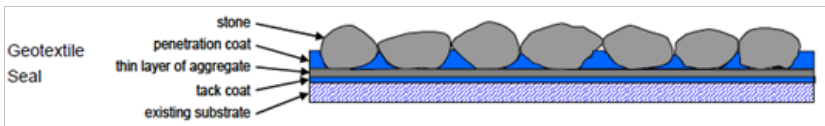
Geotextile reinforced chip sealed road pavement cross-section (SANRAL 2007)
